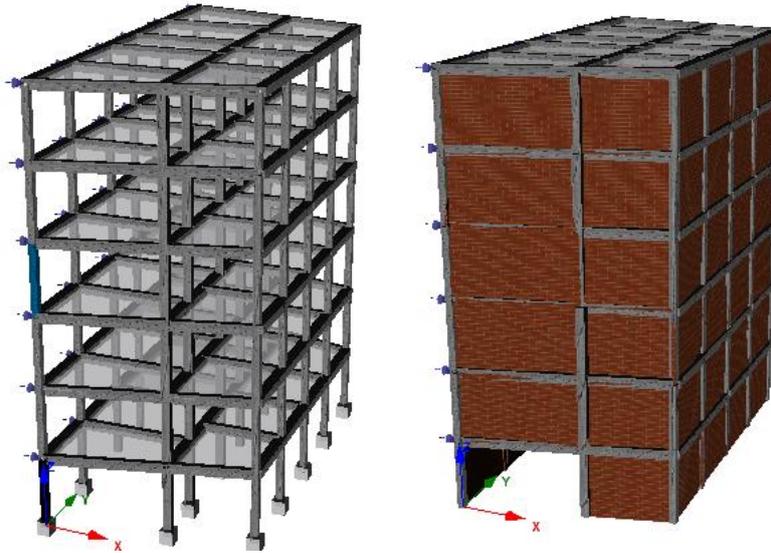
(a) Bare frame model; (b) Frame with Infill walls model.
